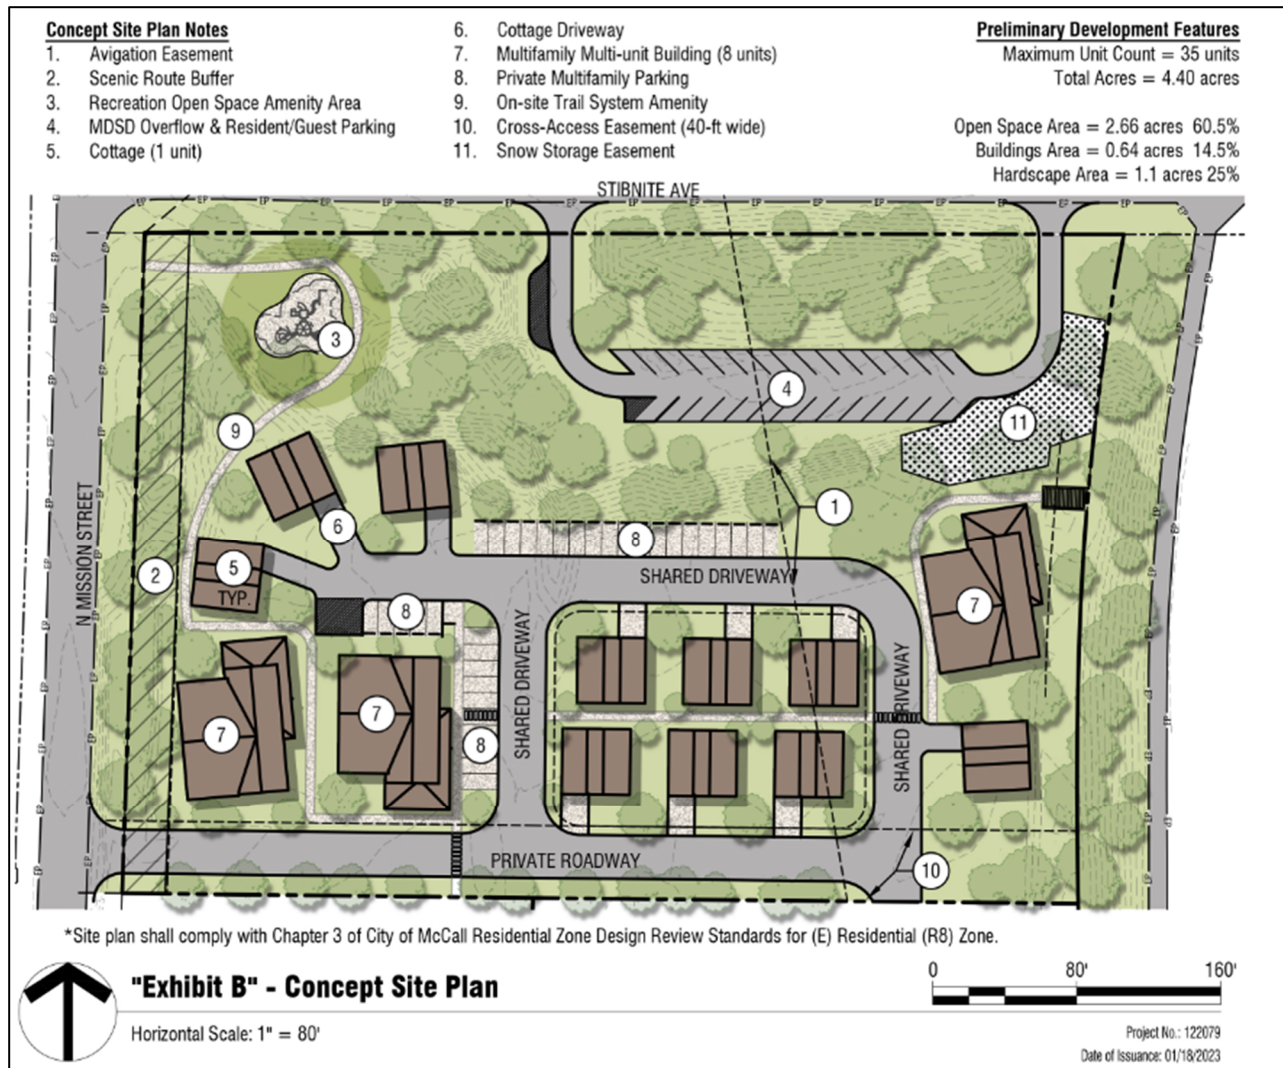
Development Agreement Concept Site Plan – Refer to ZON-22-02 for full document
